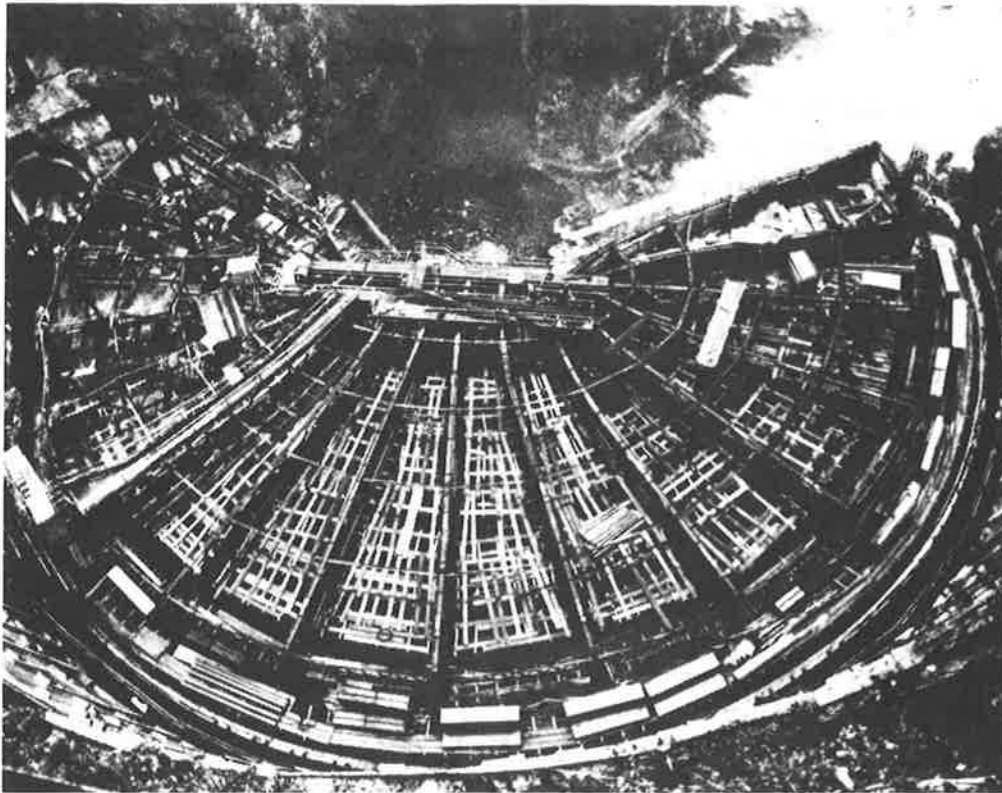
Bird's-eye view of roof structure of main dining hall under construction.
